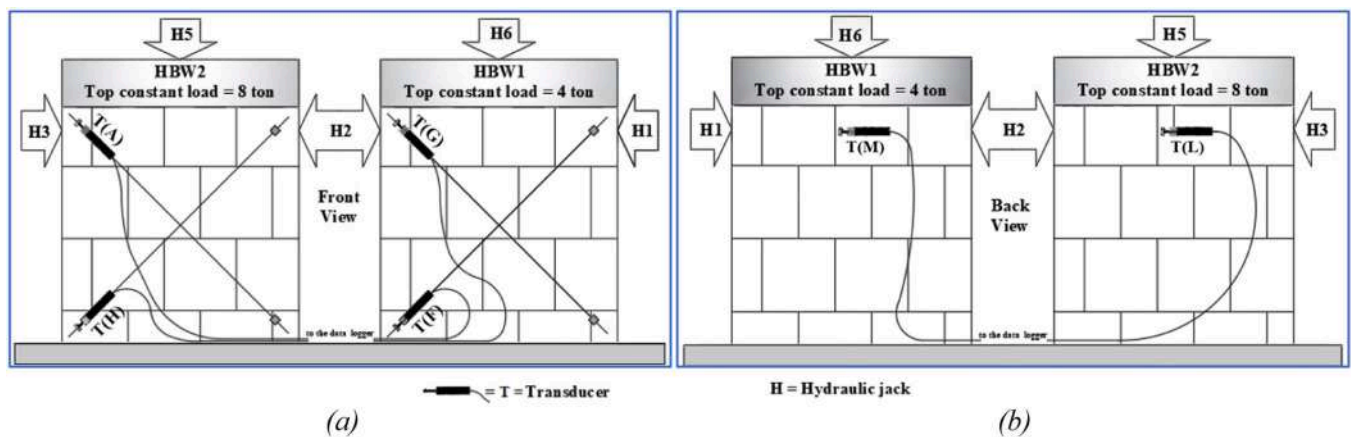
Test setup: Masonry walls (HBW1 and HBW2) without reinforcement: (a) Front and (b) back views.
